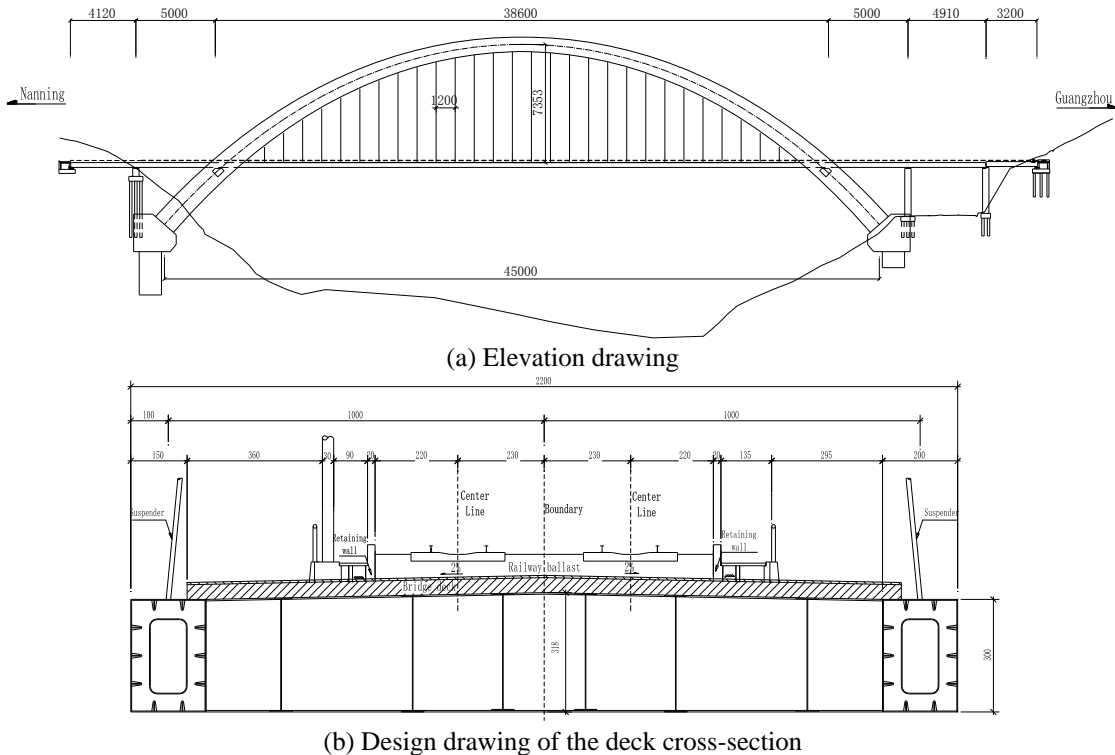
The geometry of Xijiang bridge (unit: cm)
